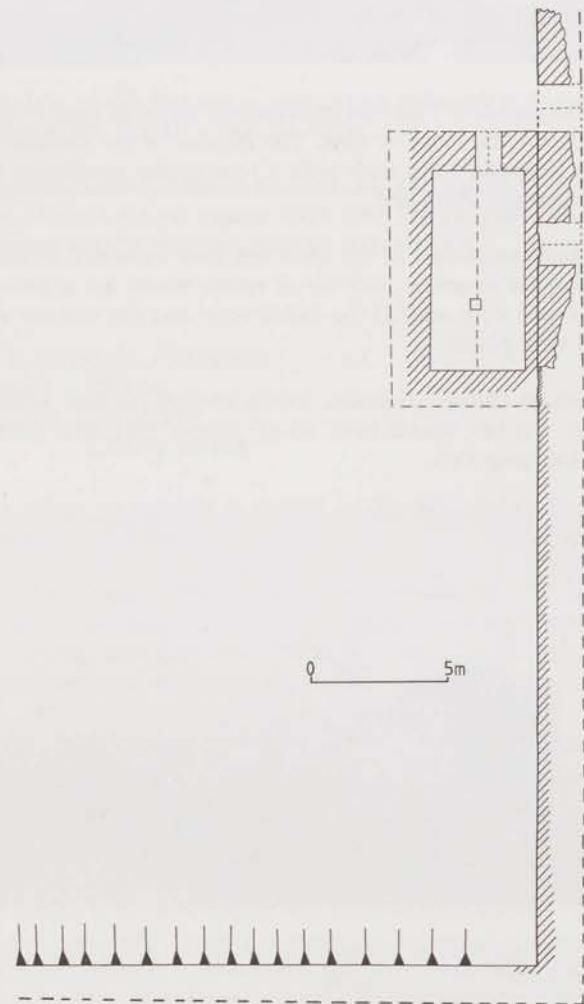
Khirbat Sukrayr (No. 138). Plan of remains of khān.
